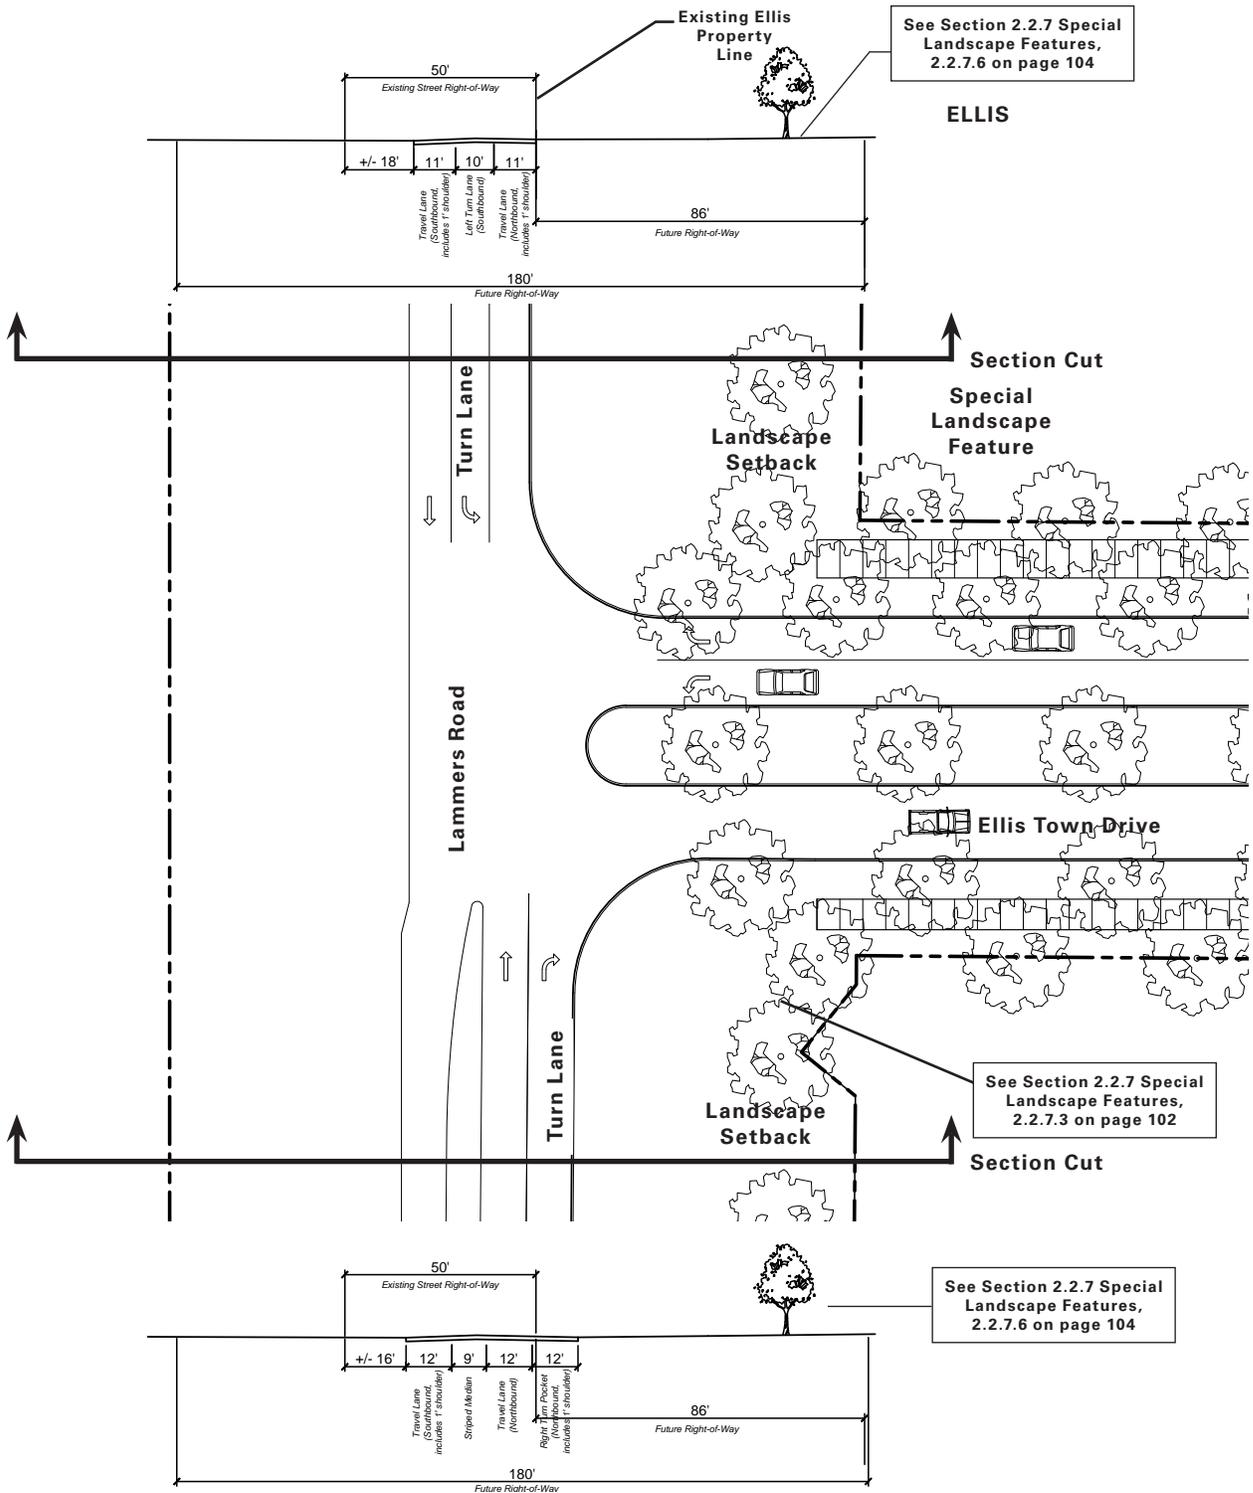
Existing Section and Plan: Regional Arterial – Lammers Road, Designation A (Cross-section at the time of connection of Ellis Town Drive to Lammers Road)
